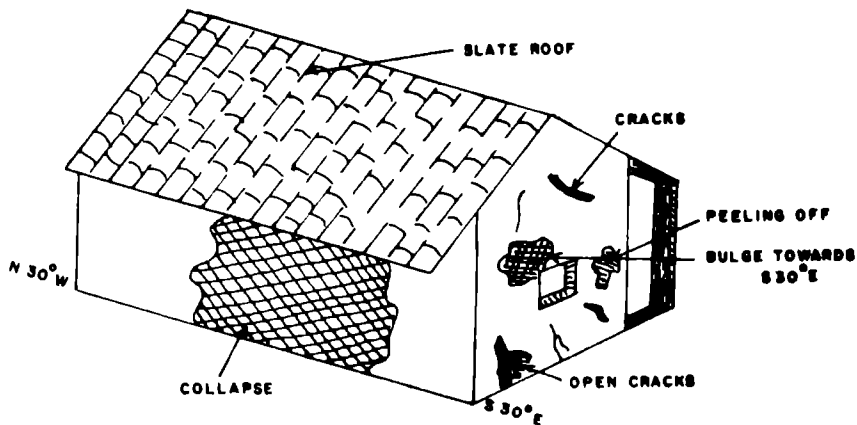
DAMAGE OF KUTCHA HOUSE, JAKH
